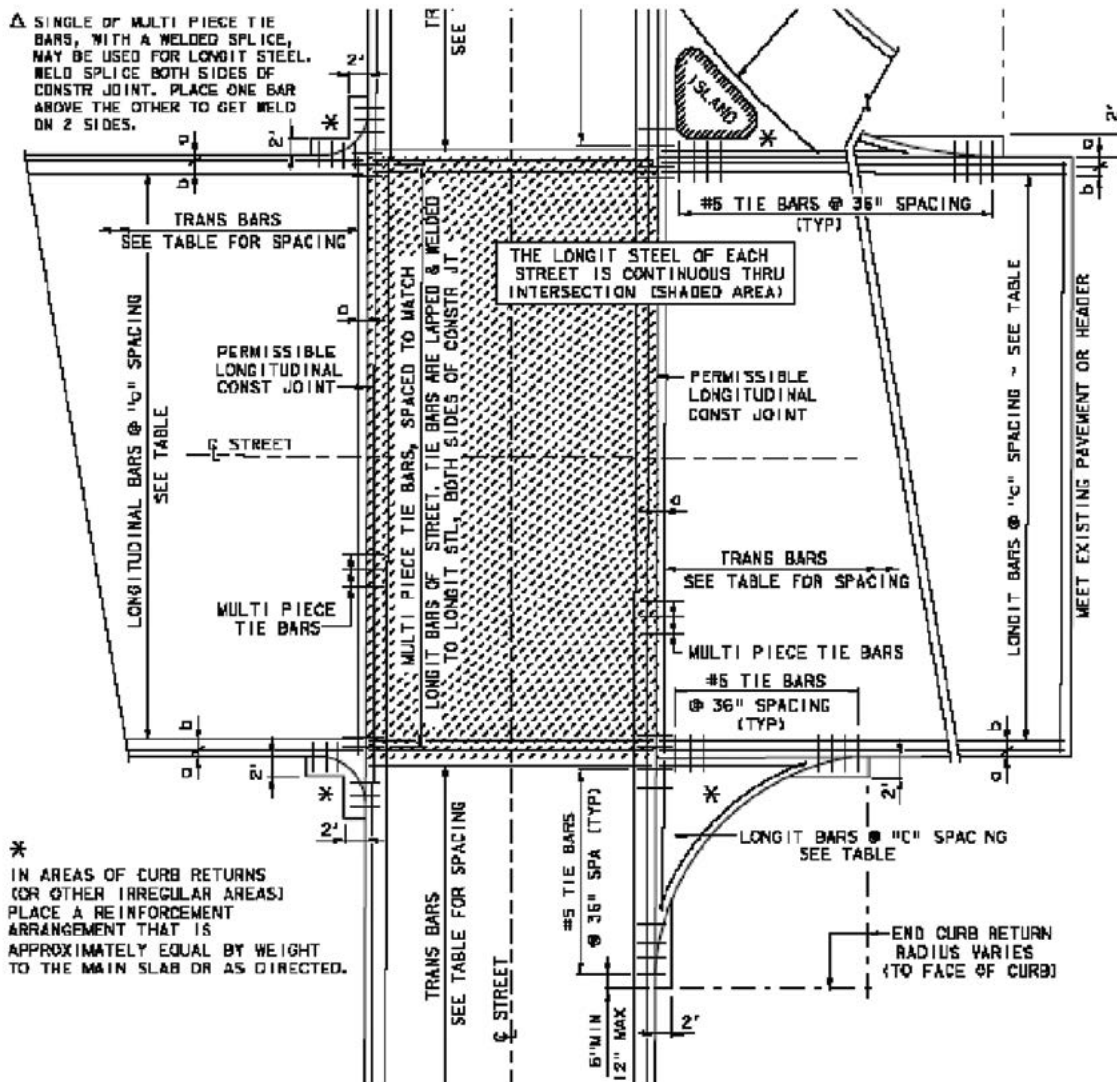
Design details for intersection of two CRCP alignments (Texas).
